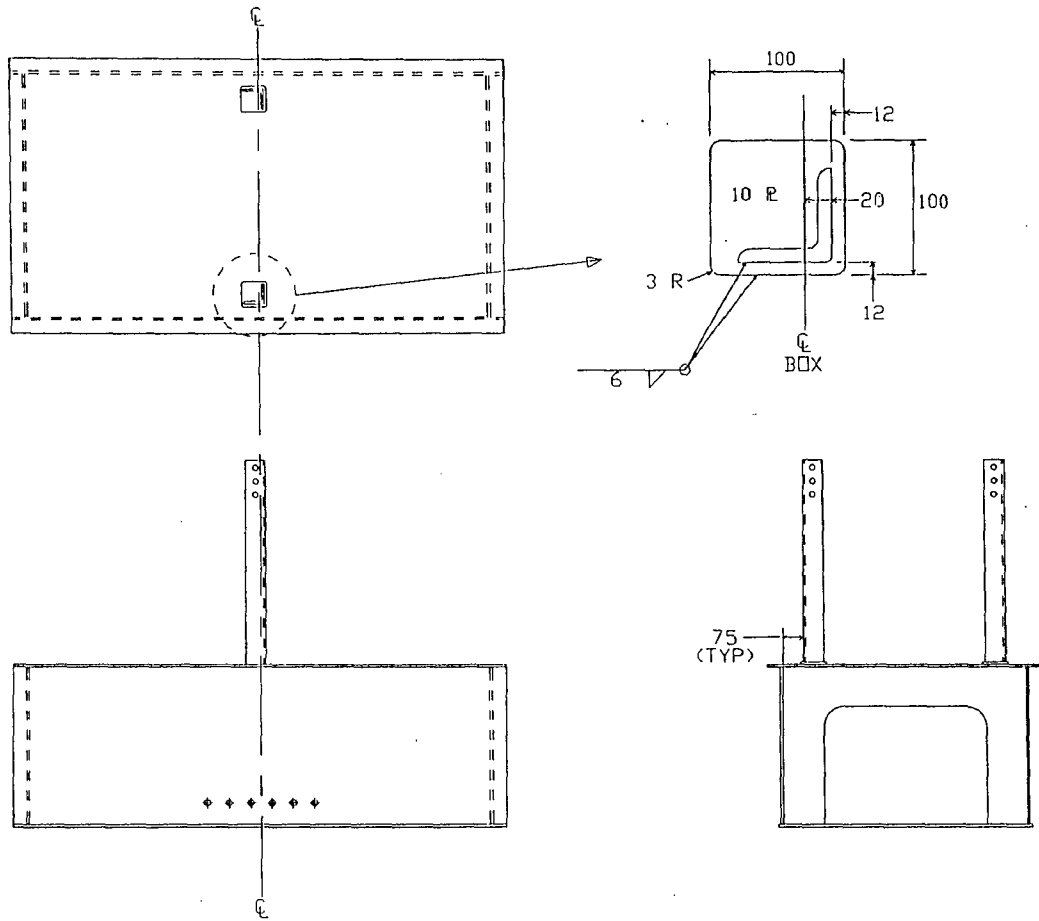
Alternate 1 - 85 mm eccentric detail Axial Specimen detail drawing
